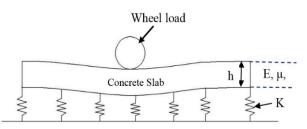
Deflection of concrete slab on subgrade soil due to wheel load
